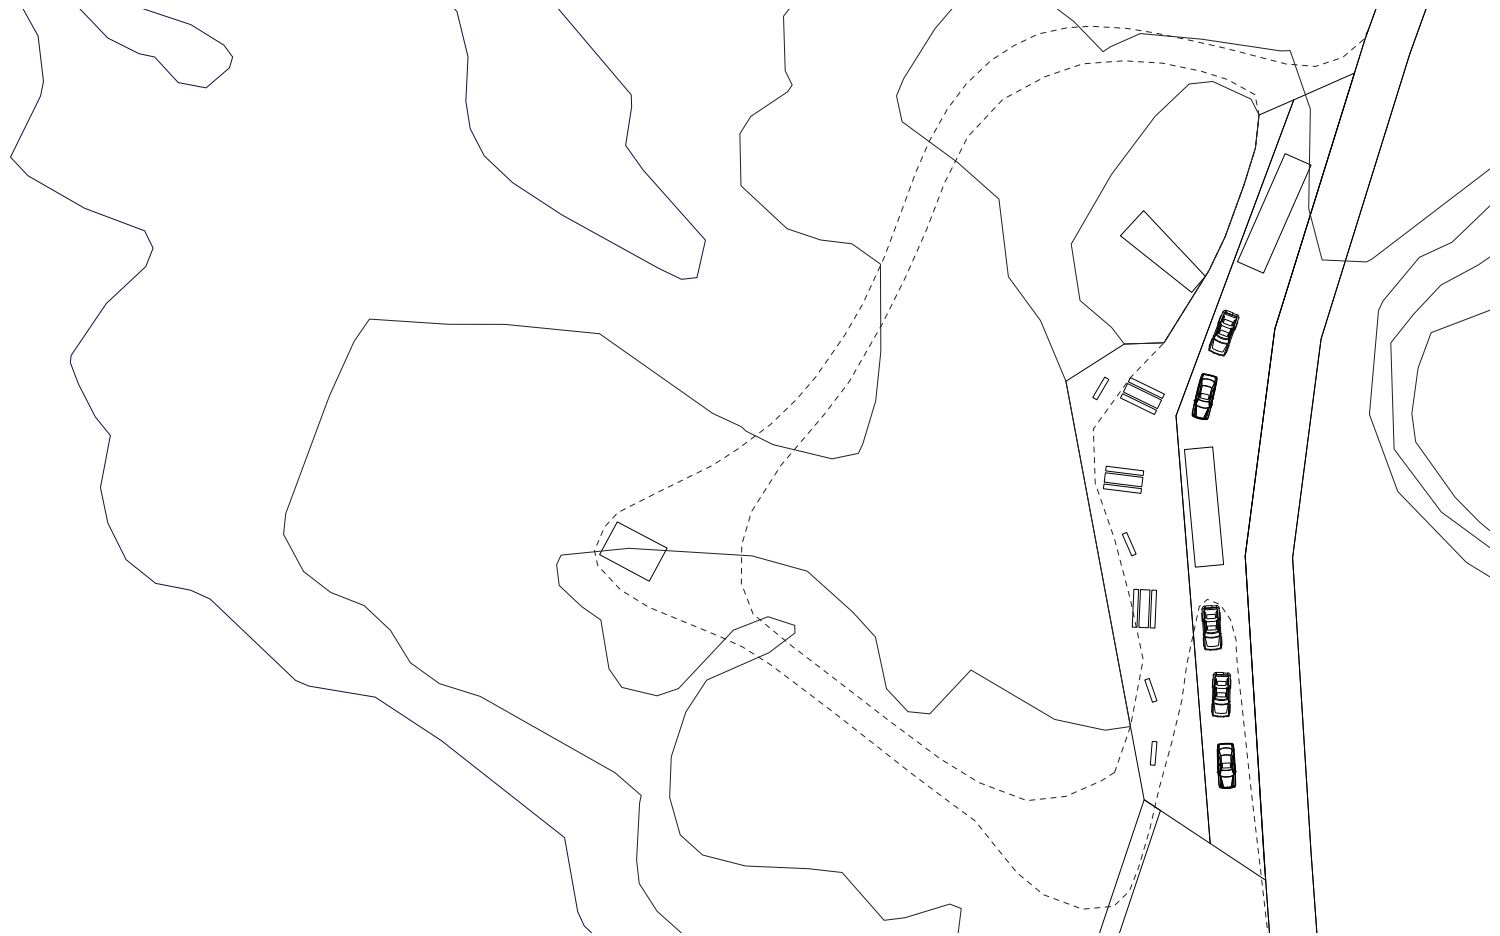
Plan – Kleivodden: parking area and picnic platform. Existing gravel service road is marked by the dashed lines.
